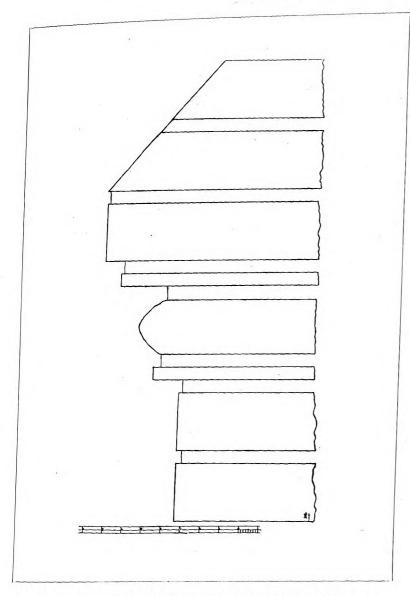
Cable on West Front of Buildings at Sissinghurst Castle.
